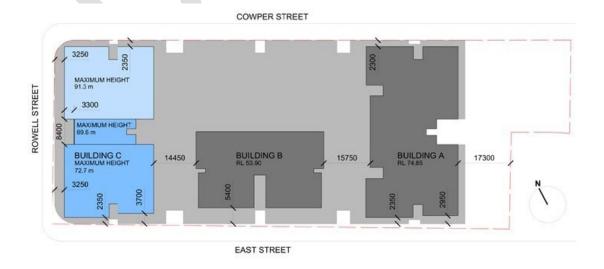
Building C Envelope, Heights and Setbacks
